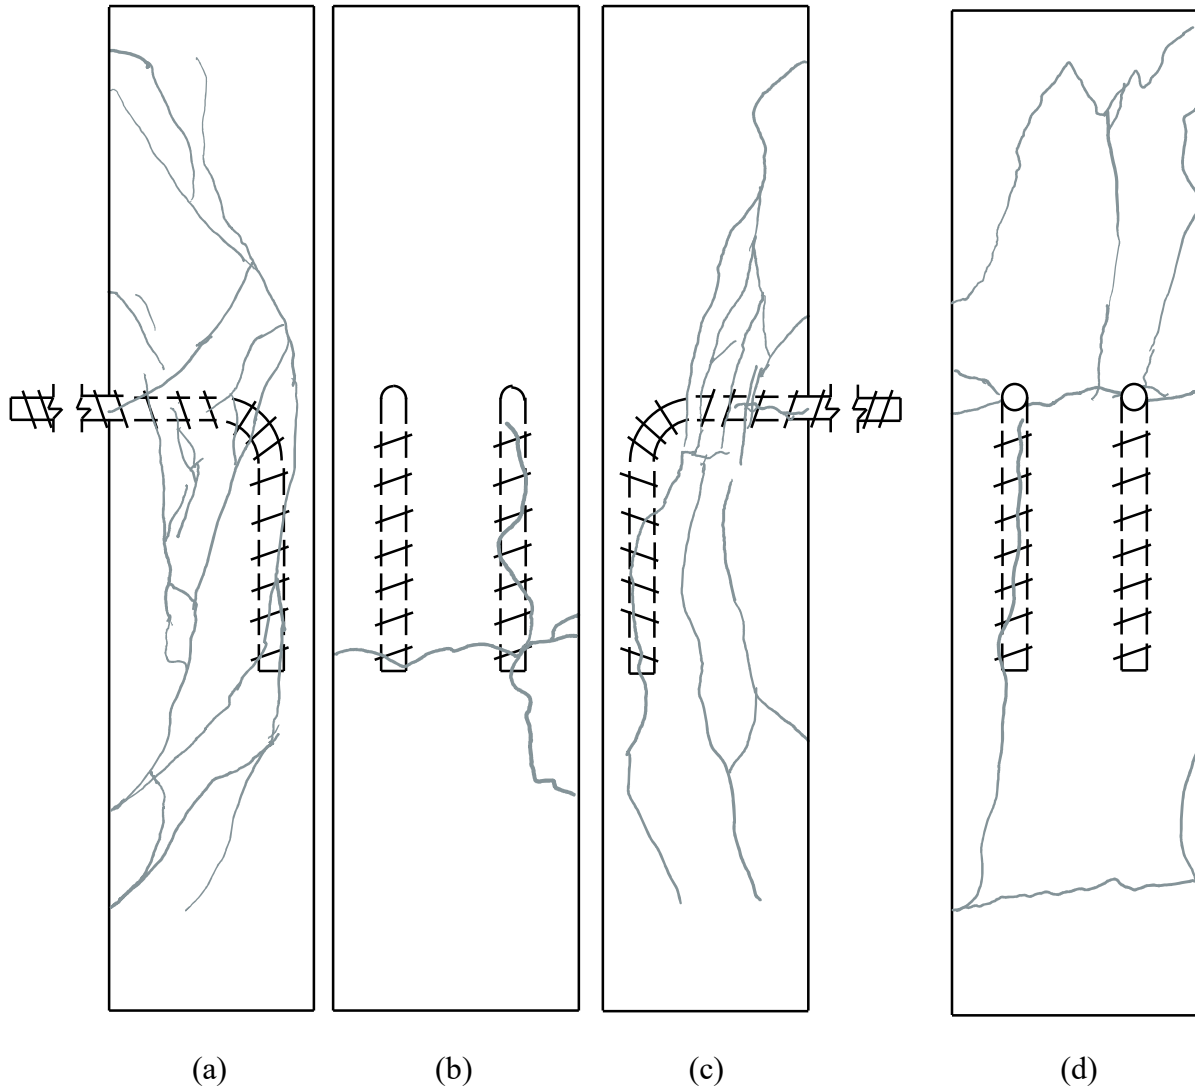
Crack pattern at maximum normalized tensile load for beam-column joint specimen MD4-90: (a) west side face, (b) back face, (c) east side face, and (d) front face
